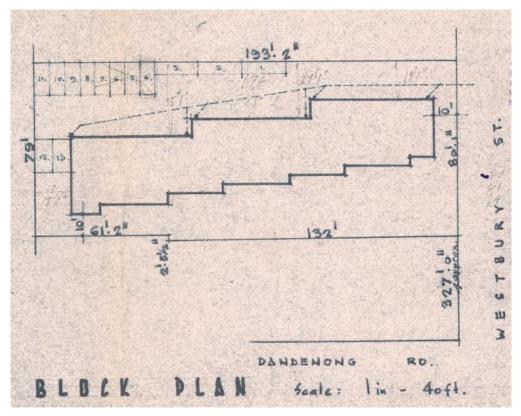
1960 drawings, Block Plan showing building footprint (Source: Building File)
